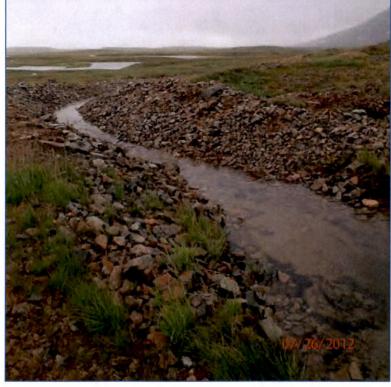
Site 9 Landfill – Pond outlet ditch in good condition and operating efficiently, facing northeast.
